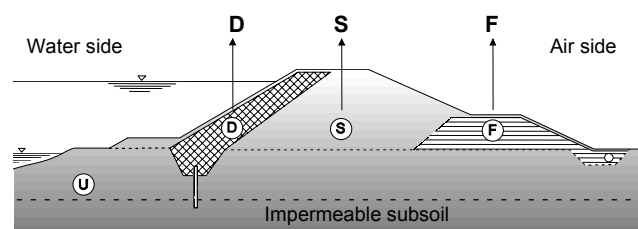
Three-Zones-Dyke cross-section (DVWK 1986)
